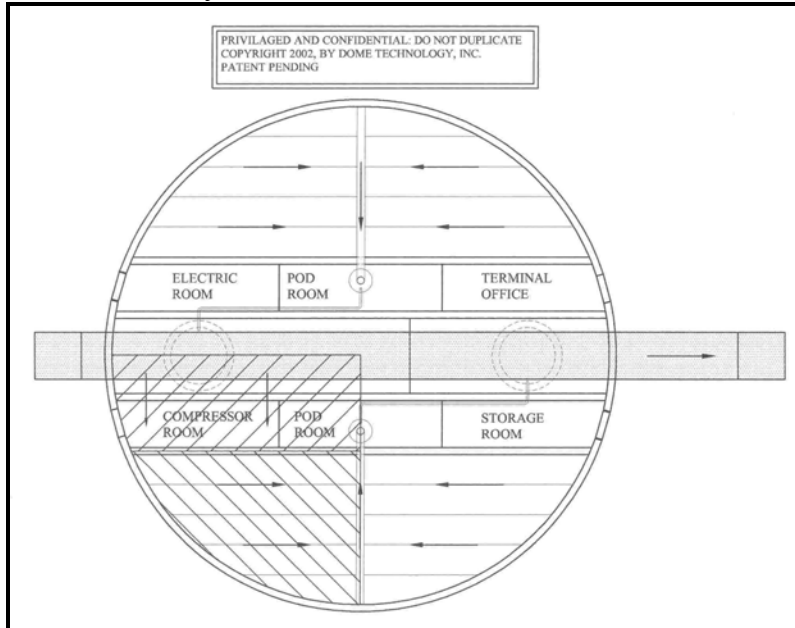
Truck Loading in Tunnel, with Surge Bins
